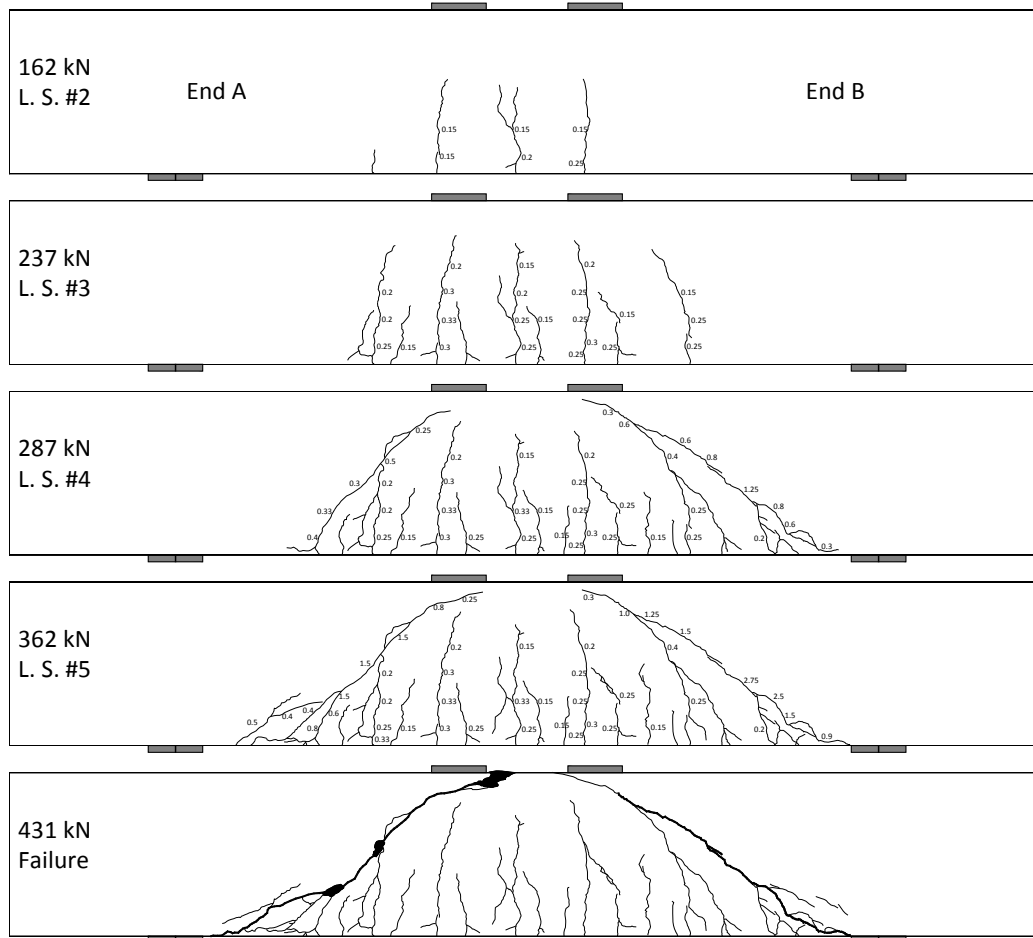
Crack diagrams of specimen B3N showing the development of the cracks and the widths as loading progressed.
